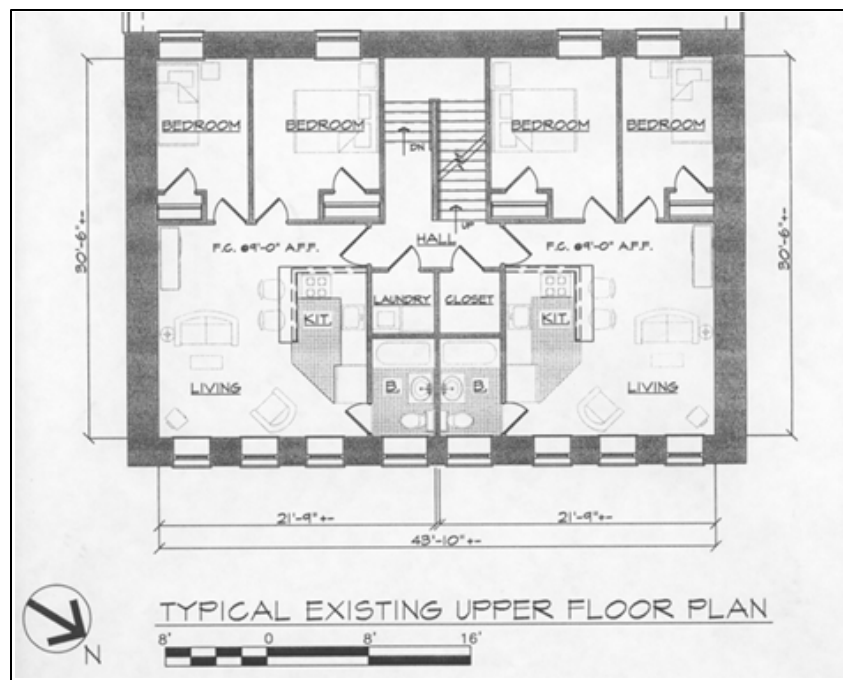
Possible two bedroom apartment floor plan.¹⁰⁴
